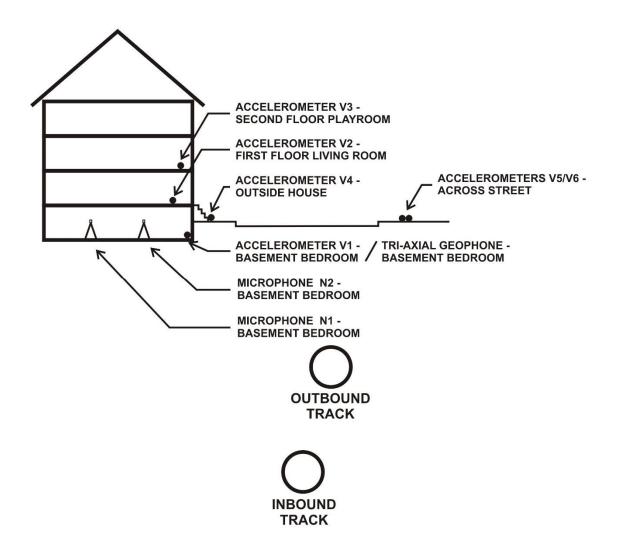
Site 1 Cross-section Sketch (not to scale) of Indoor and Exterior Measurement Locations
